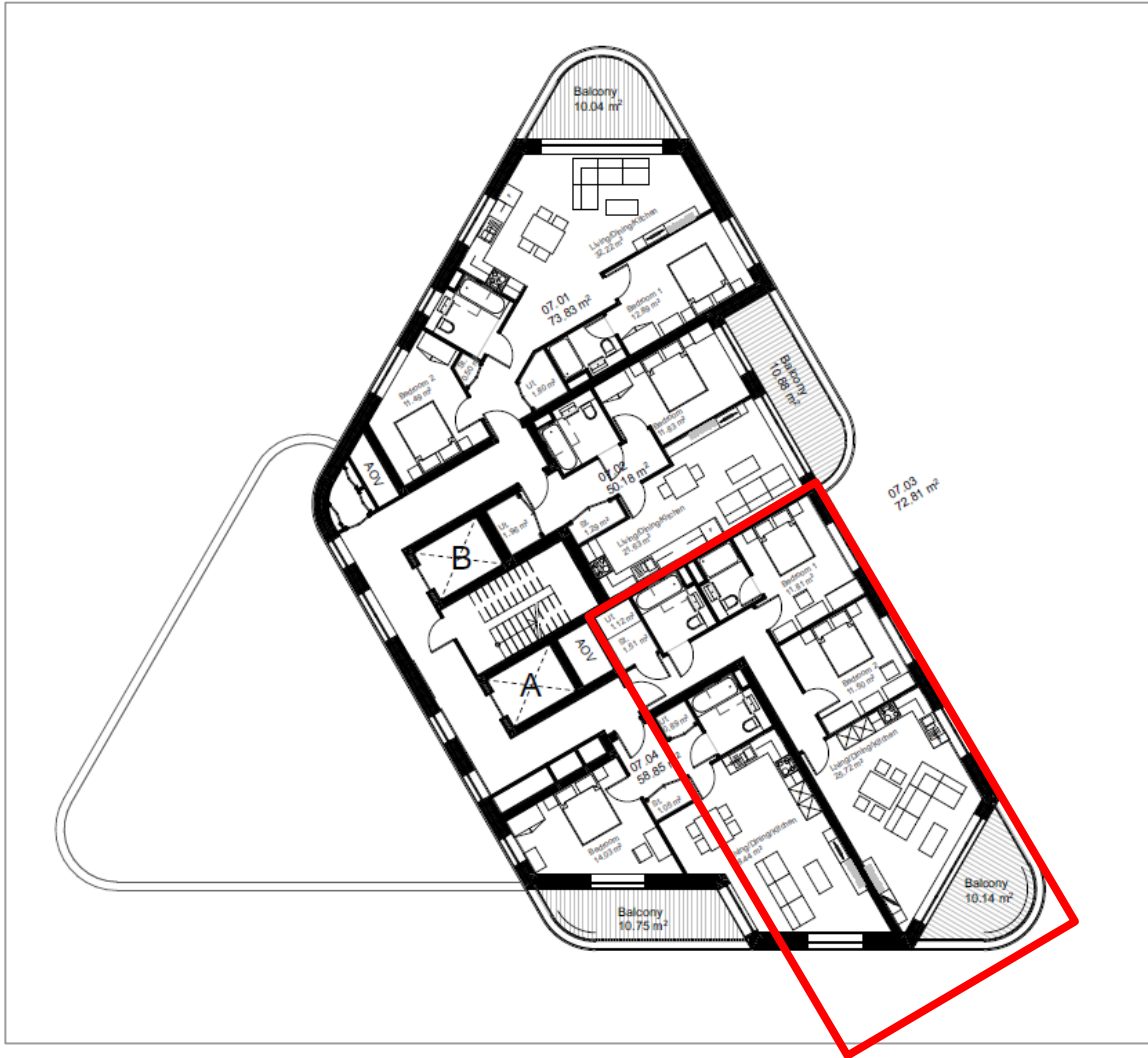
7th floor plan, B.07.03 Top-floor dual-aspect east facing 2bed apartment, Medium noise risk category (Source: Stock Wool Architecture 17.12.2020).
